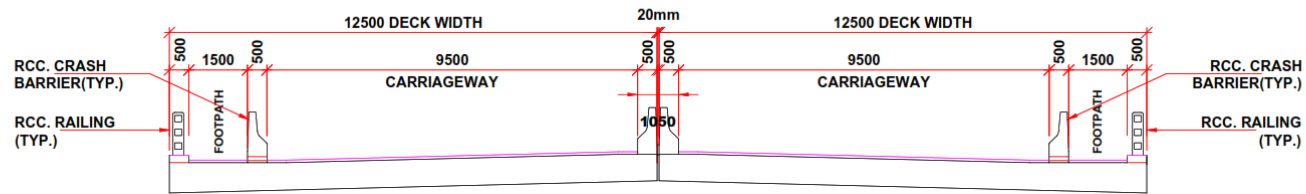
(b): CROSS SECTION OF BRIDGE/AUP
